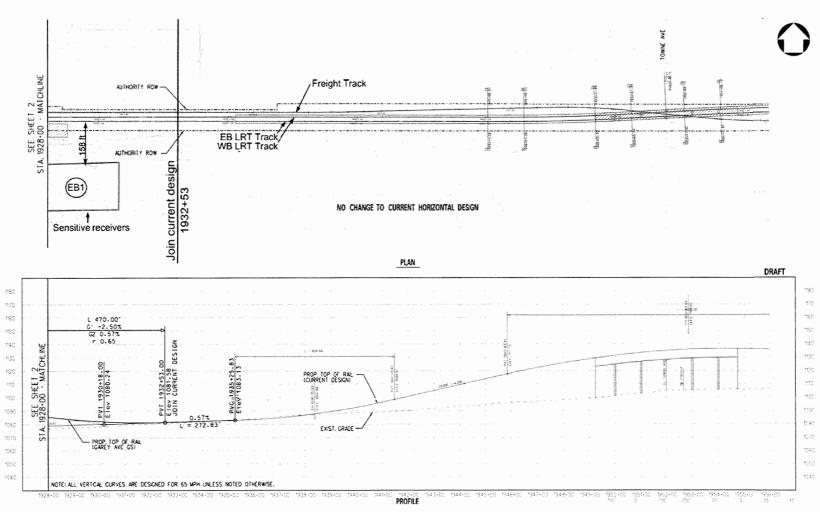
Plan and Profile of Garey Avenue LRT Bridge (Page 2)
